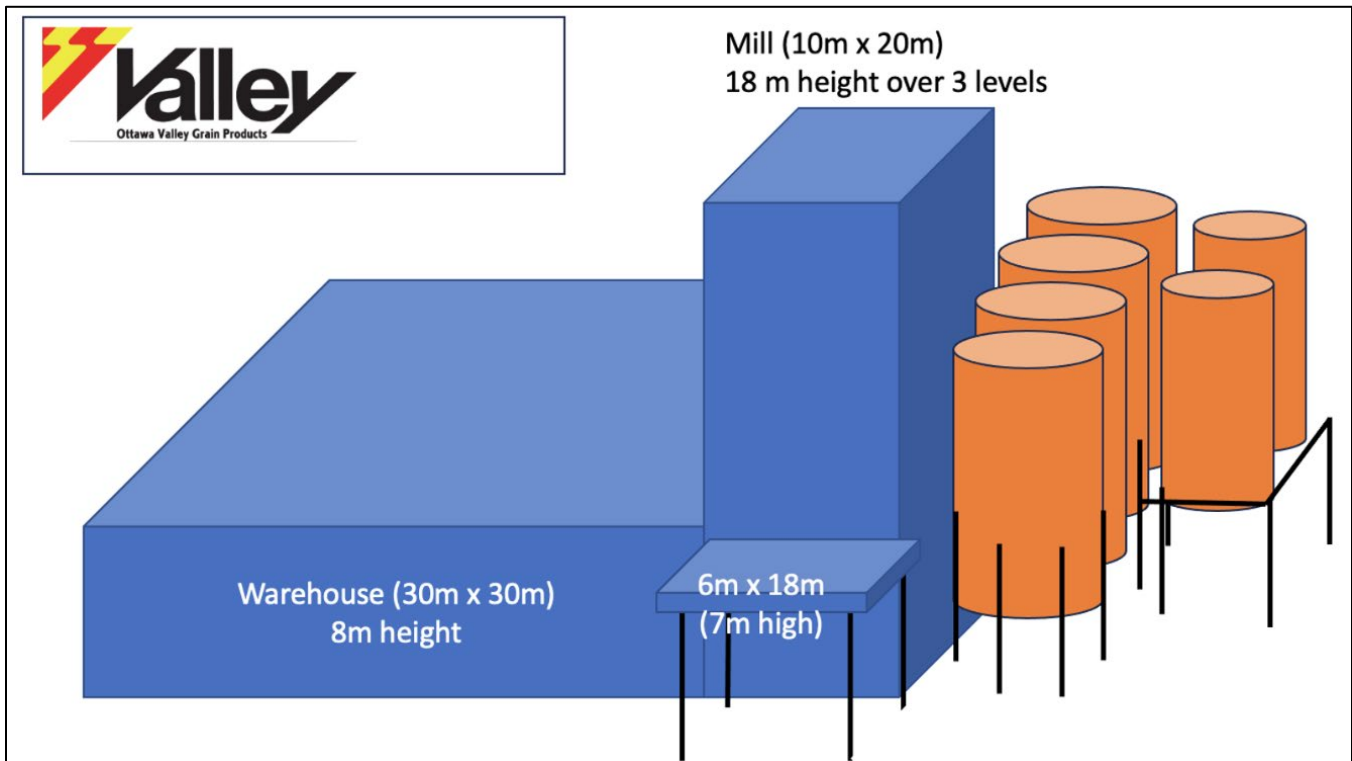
Conceptual elevation illustrating the grain mill, where additional building height is being requested. The vast majority of the building is within the permitted maximum building height of 11 metres. Si
